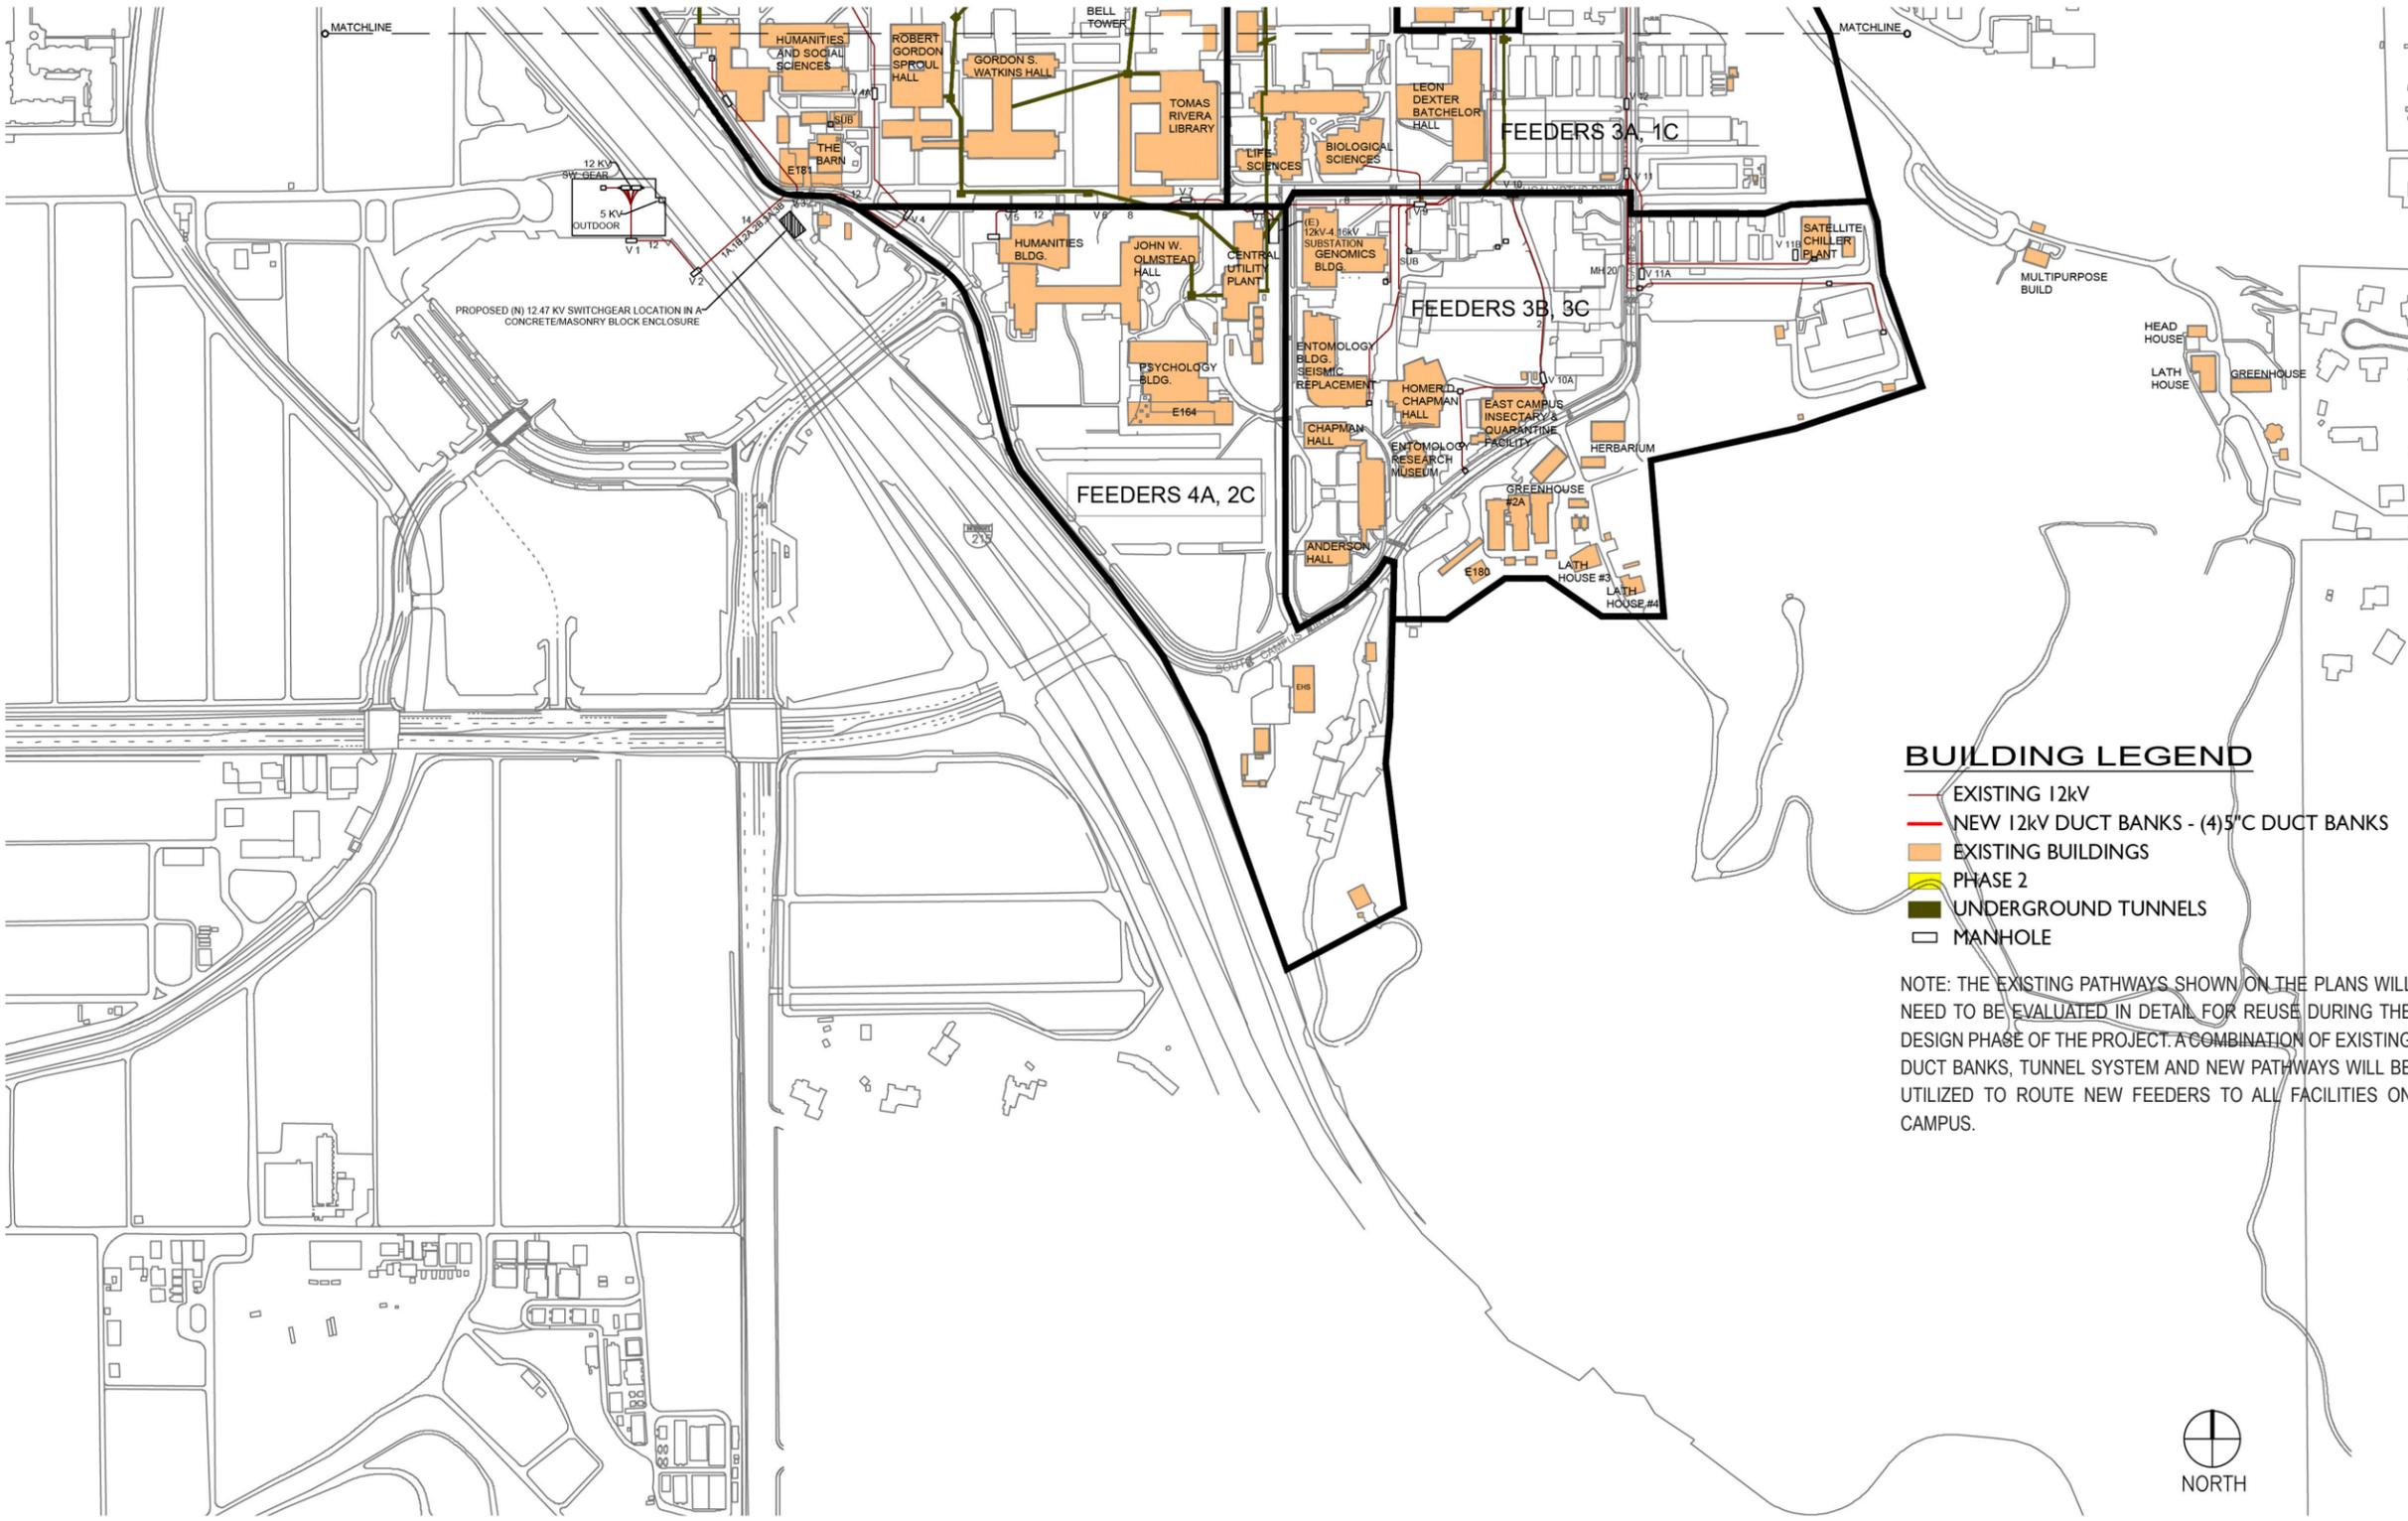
Phase 2 Buildings Electrical Site Plan–South
